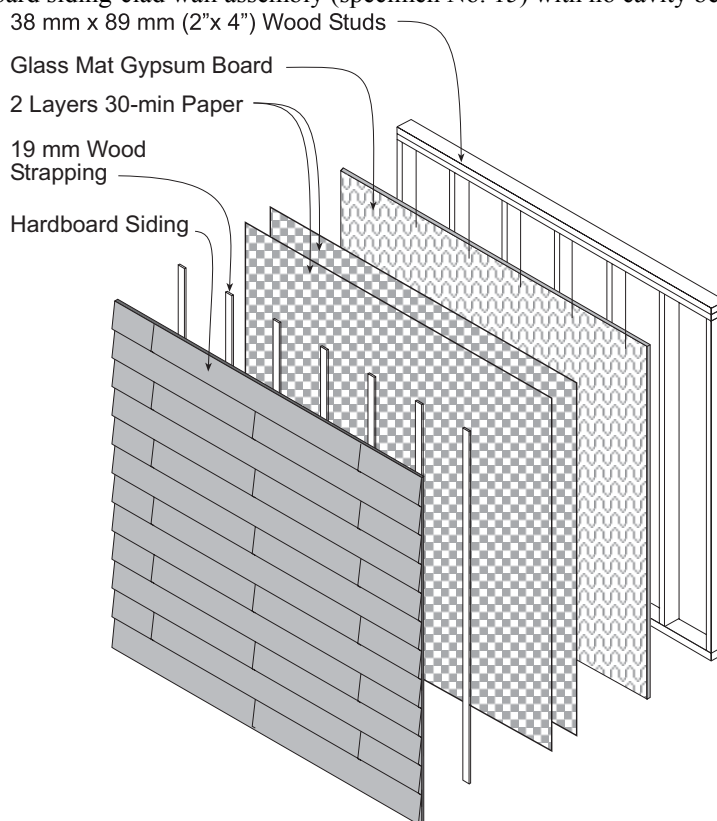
Hardboard siding-clad wall assembly (specimen No. 16) with a 19 mm cavity behind the siding
